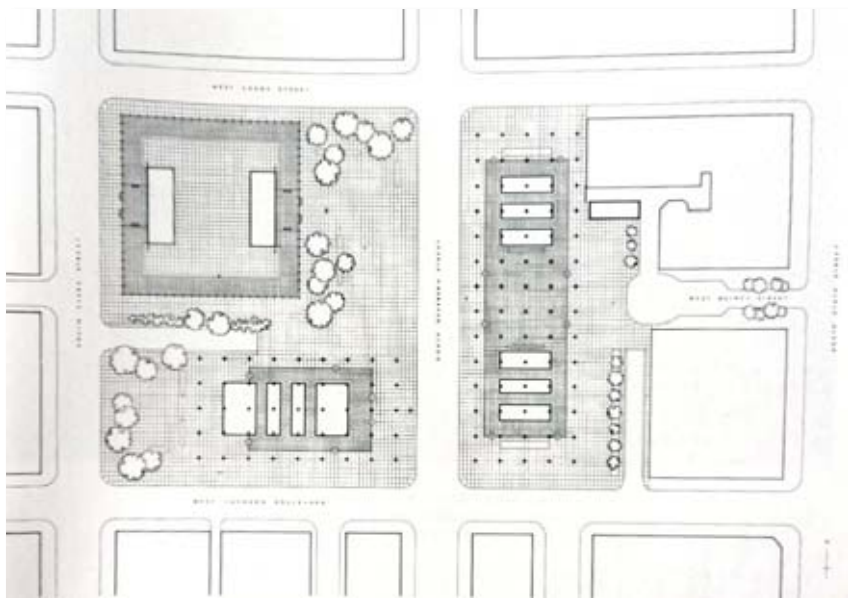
FEDERAL CENTER CHICAGO, FLOOR PLAN
